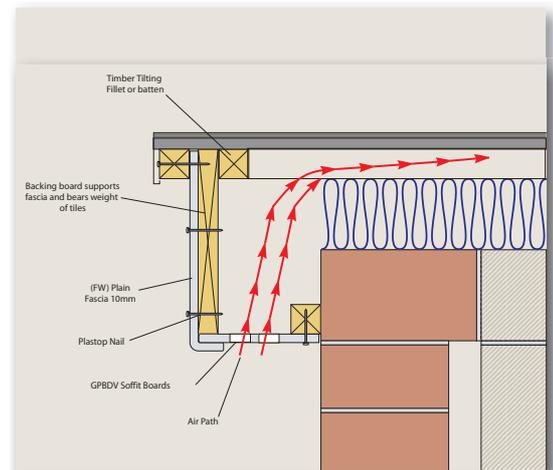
Flat roof configuration with Plain Fascia, GPBDV soffit and ventilation.
